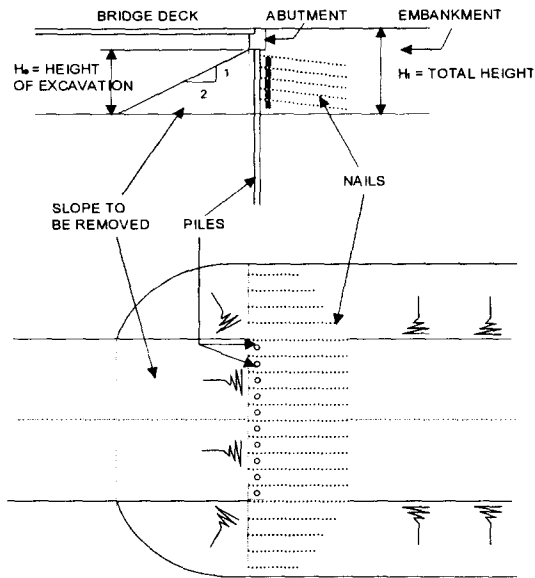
Soil Nailed Wall under Piled Bridge Abutment
